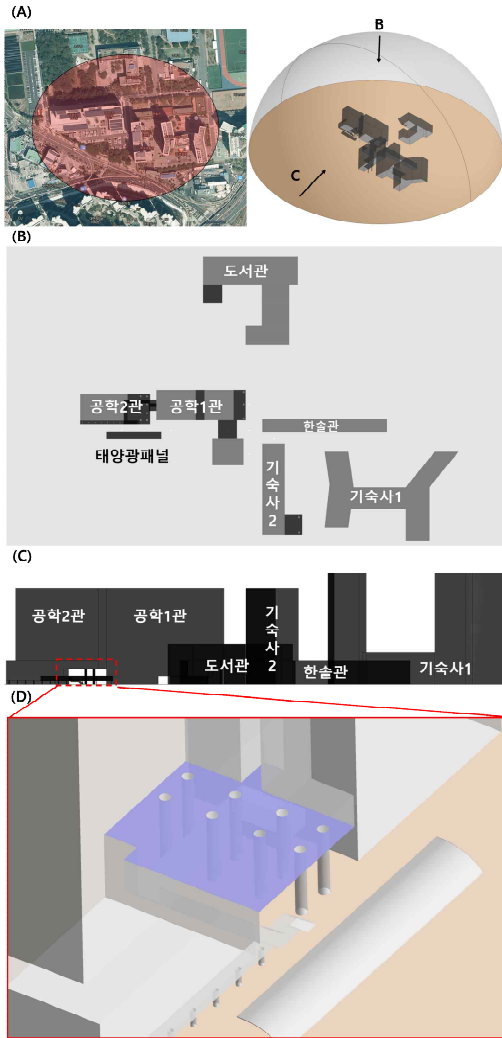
Computational domain ; (A) 3D modeling of Pukyong National University engineering building with surrounding buildings, (B) & (C) Location of buildings and building names, (D) Position of ceiling panels collapsed
